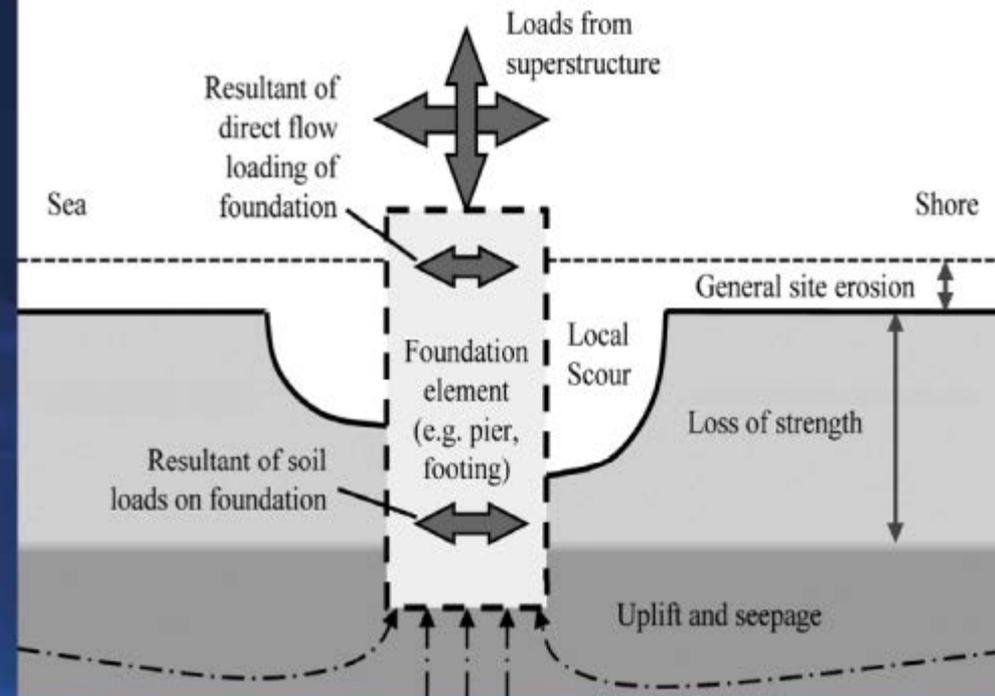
Schematic of tsunami loading condition for a foundation element
